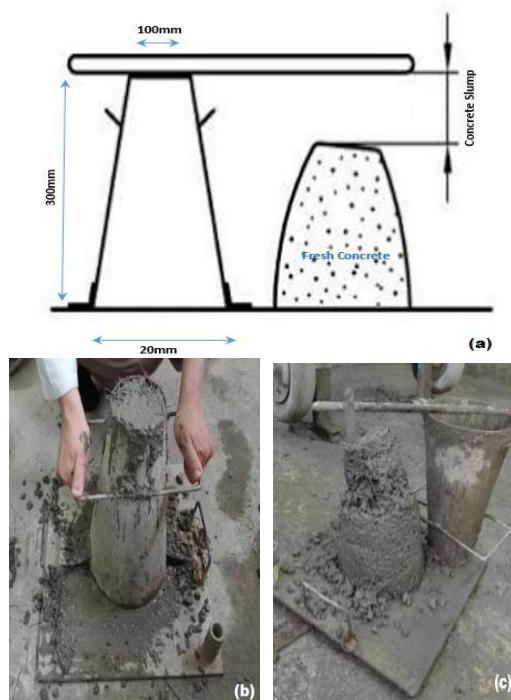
Concrete workability: (a) Abrams Cone and slump test, (b) Workability testing, (c) measuring concrete slump
